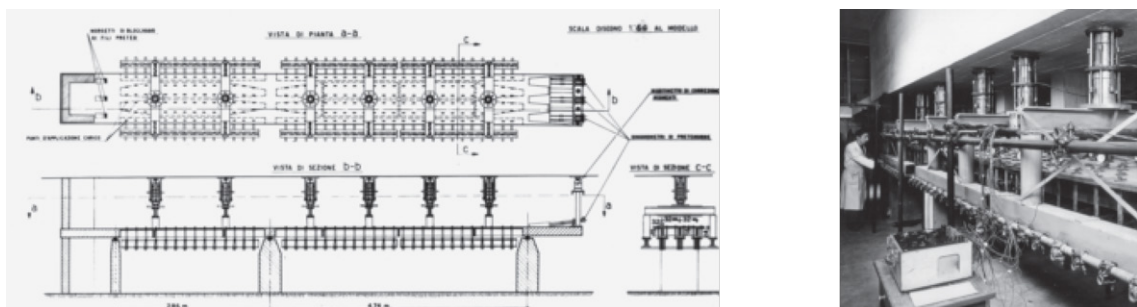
Structural model of slab floor (scale 1:5). From [40].
